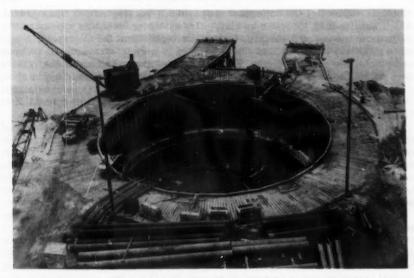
CAISSON FOR INTAKE STRUCTURE OF VENICE NO. 2 POWER PLANT.
